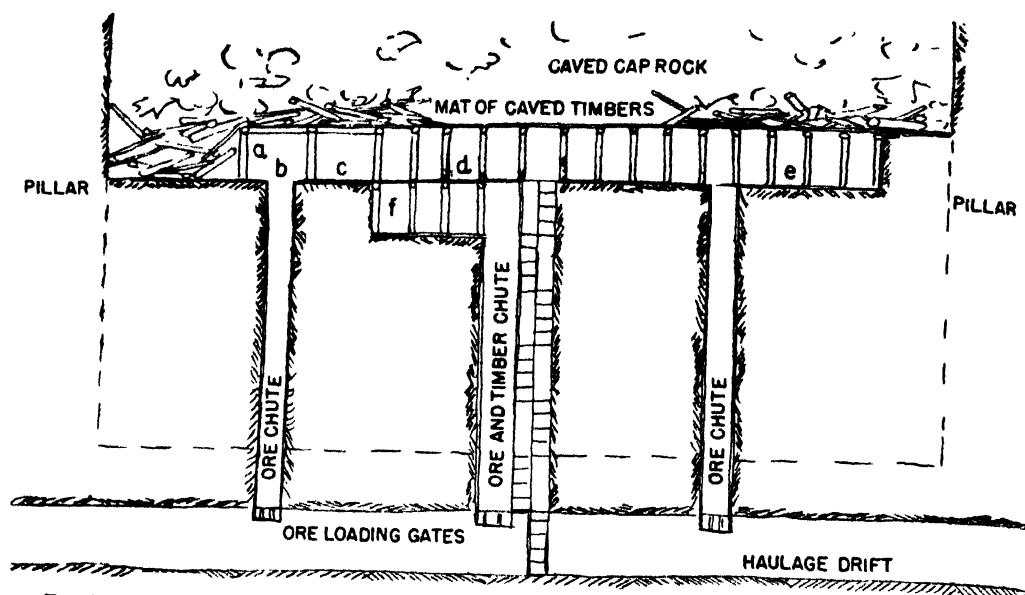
Top slicing: a, posts ready for blasting; b, completed crosscut; c, crosscut being driven; d, completed drift; e, drift being driven; f, newdrift.
